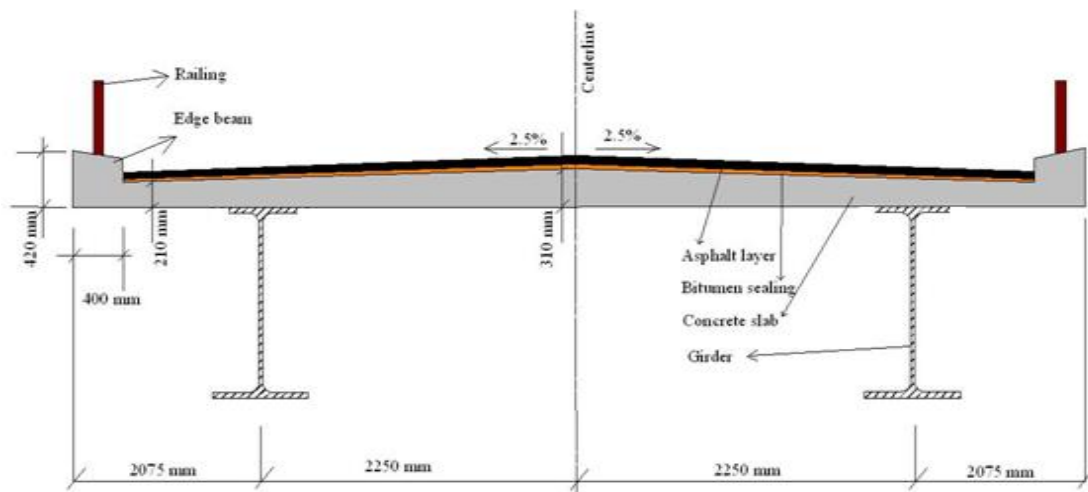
Bridge deck slab cross section constructed with NSC. Adapted from (Trafikverket, 2000).
